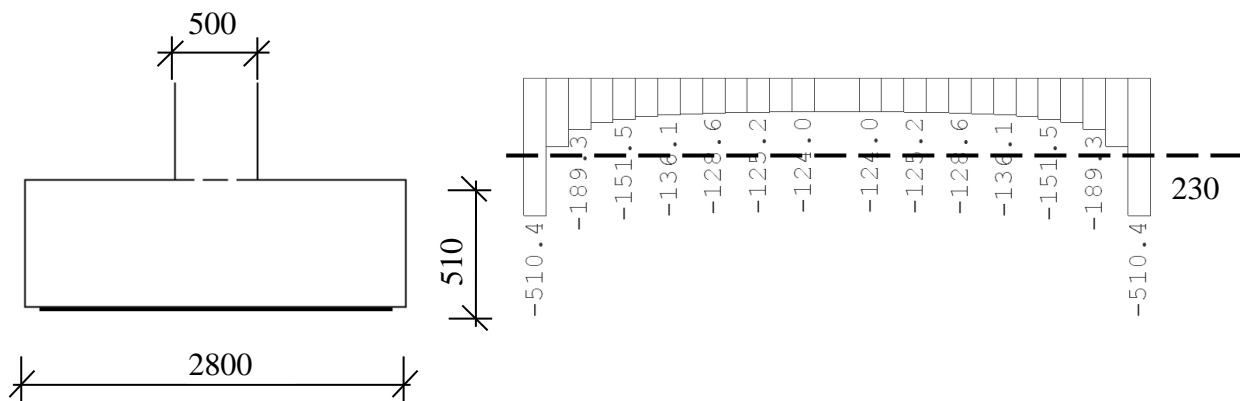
Footing without shear reinforcement (left), ground stress [kPa] (right) – Subsoil 1.
